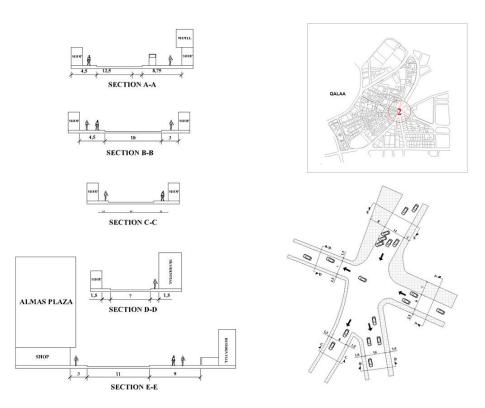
Street intersection details map2 of Khanaqa neighborhood.
